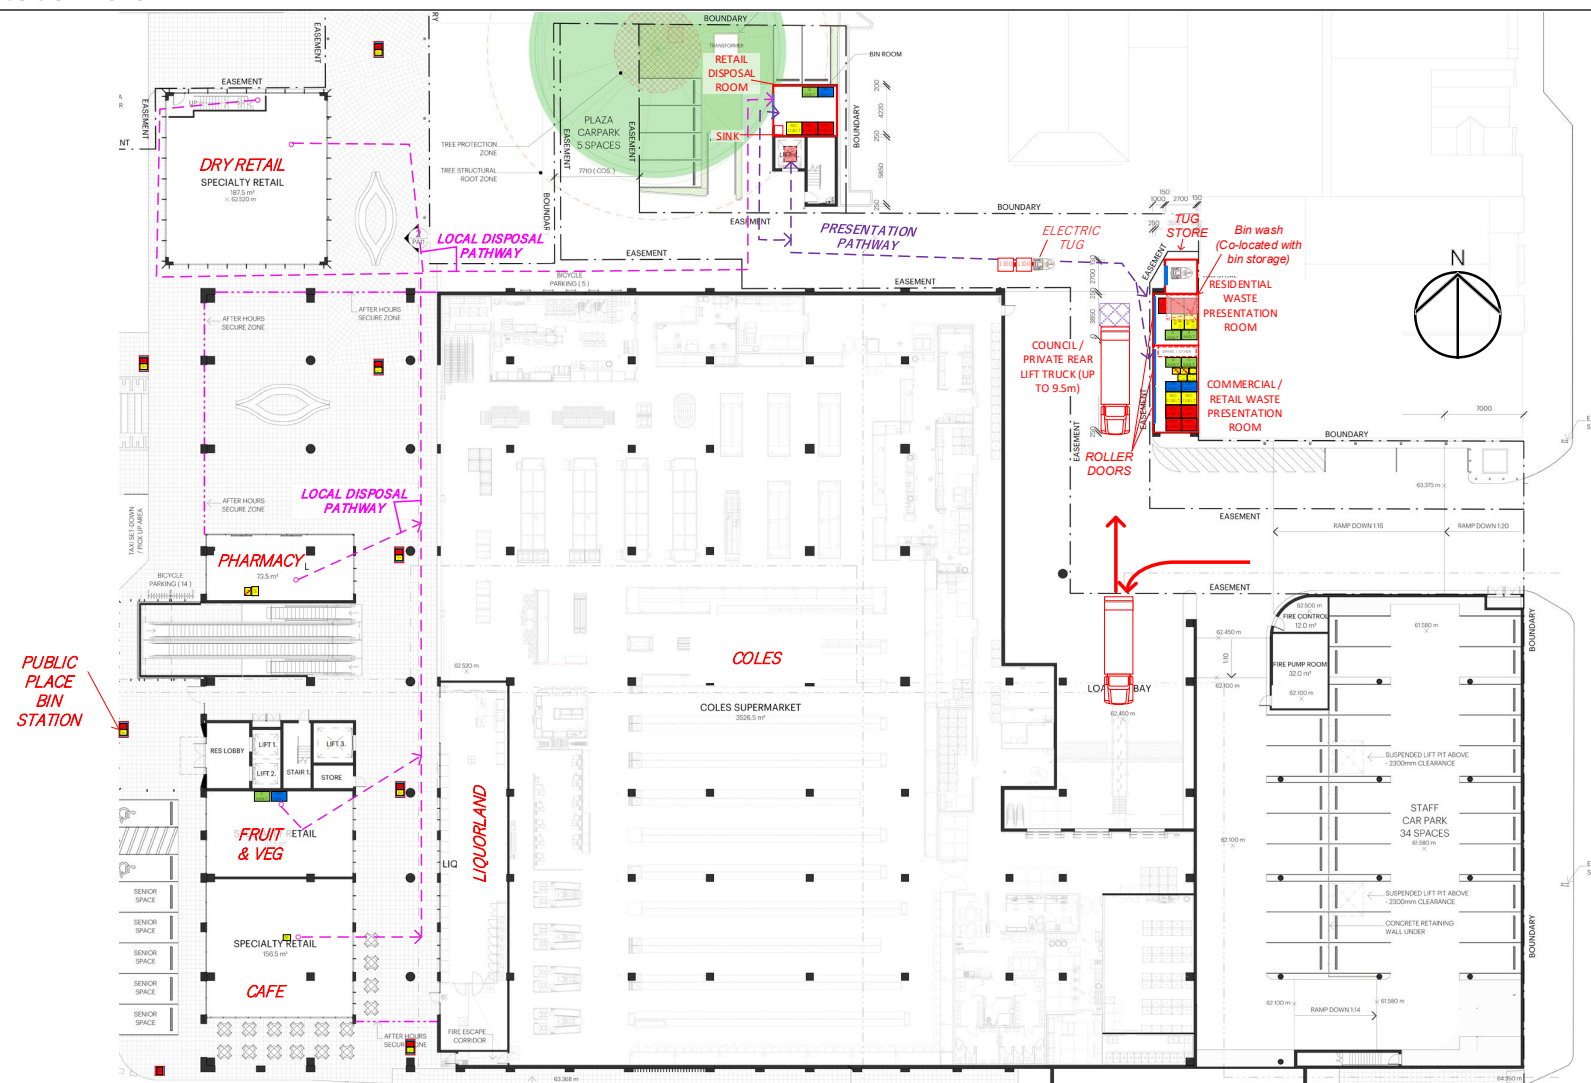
Site Overview showing Key Transfer Paths and Storage Rooms
